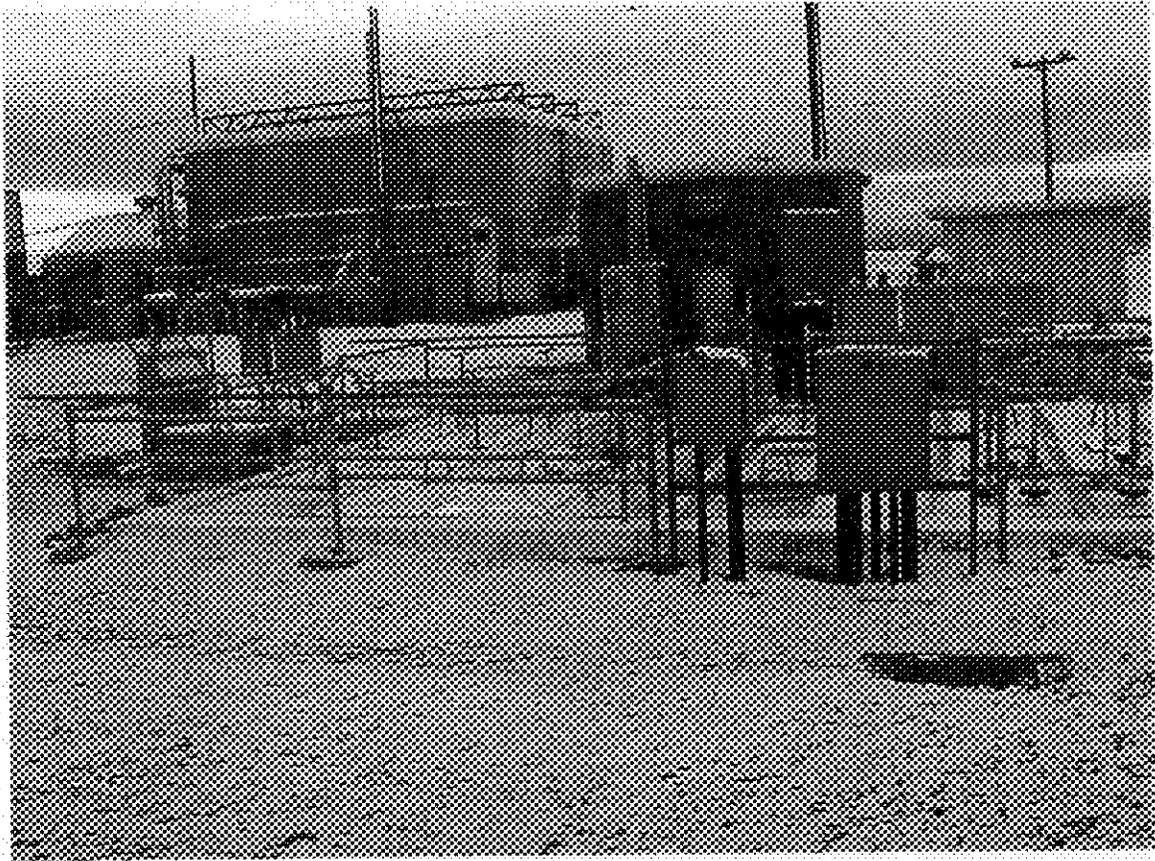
244-TX Double-Contained Receiver Tank. Instrument Pit (far left foreground), Pump Pit / Filter Pit (with concrete cover blocks) and Instrument Building (adjacent to middle of vault).
